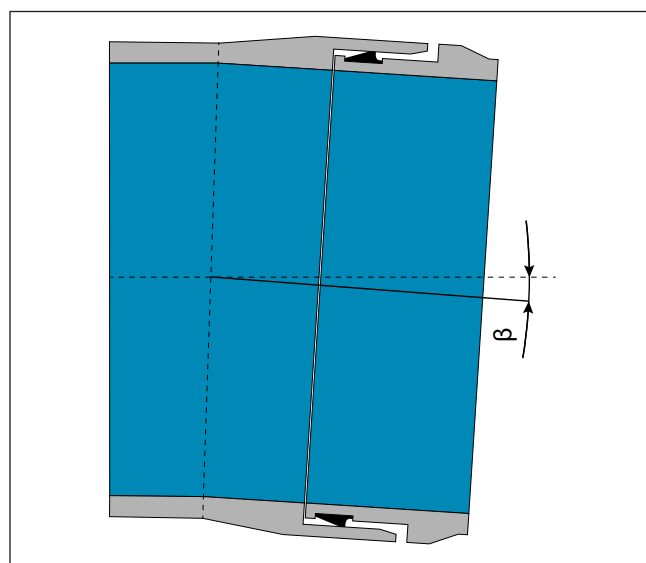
Spigot/socket connection with enlarged additional deflection of the socket-pipe
